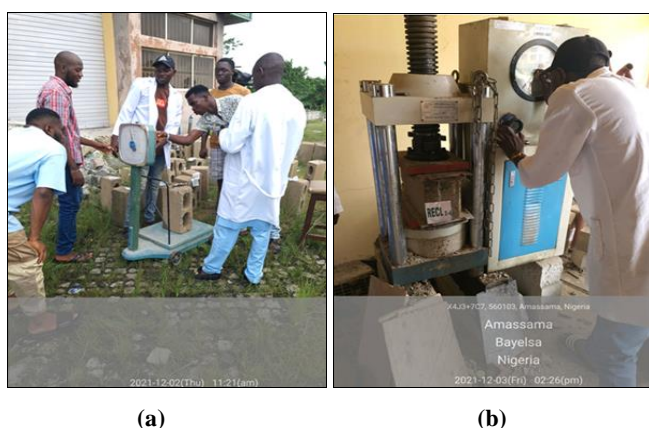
(a): Team members taking mass reading of block specimens (b): Crushing and taking reading in the Compressive Strength test machine STYE-2000 Analogue Type Okhard Machine Tool in the Structures Laboratory as shown in Plate 4. The compressive strength results were compared to the National Building Code's (2006) standards for a conventional sandcrete block in terms of strength
